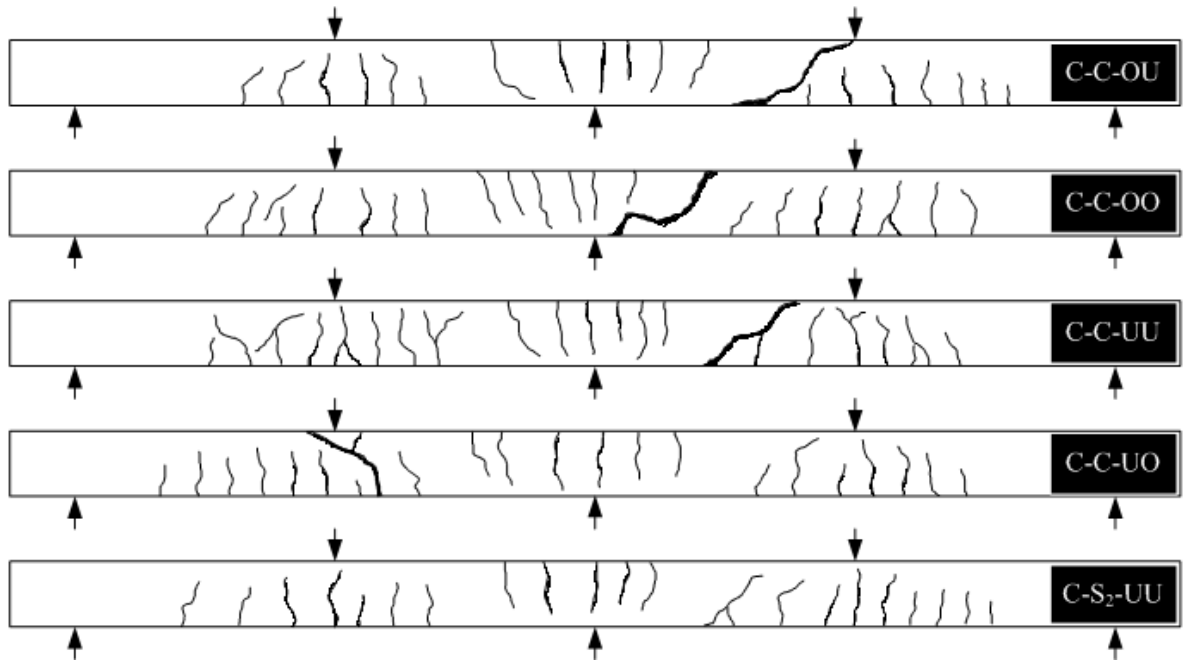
Typical cracking patterns and failure shape of CFRP RC slabs
